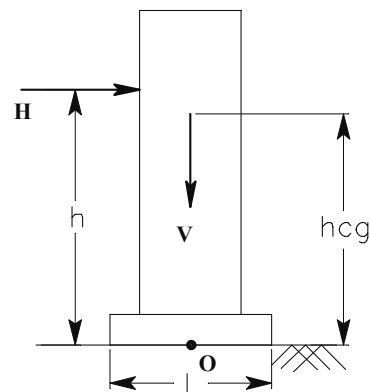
Forces acting on the wall-footing system during slow cyclic lateral push tests
